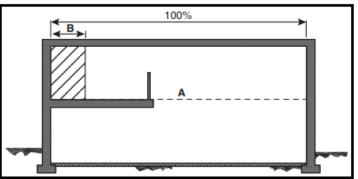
(3)-D Enclosed Spaces within a Mezzanine
